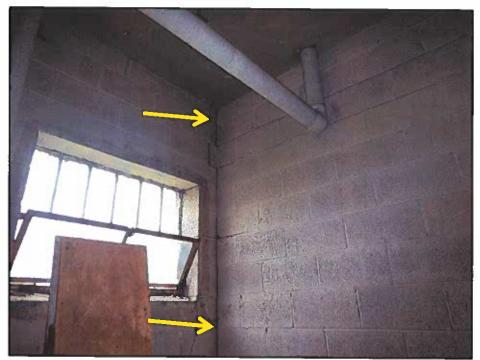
Vertical separation of the wall. Note that the blocks were not integral at this corner.
